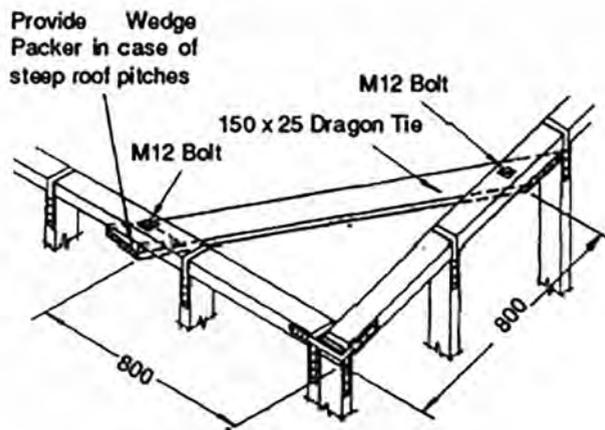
DETAIL OF DRAGON TIE CONNECTION
